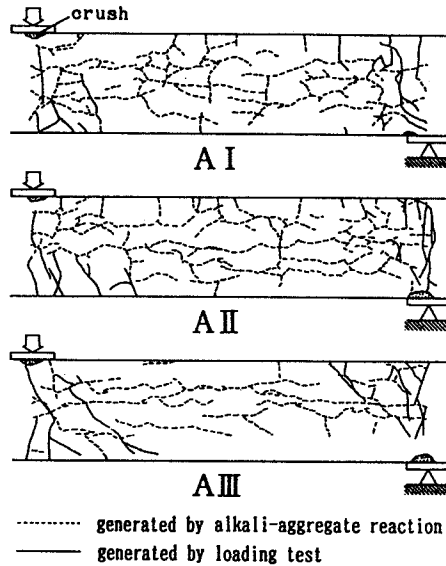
(a) Typical crack patterns ( Deformation : 0.05rad.)
